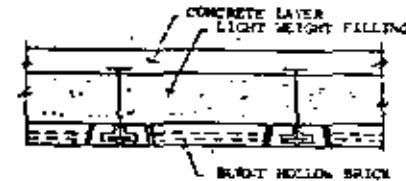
Concrete slab with ceramic plates supported by steel beams
